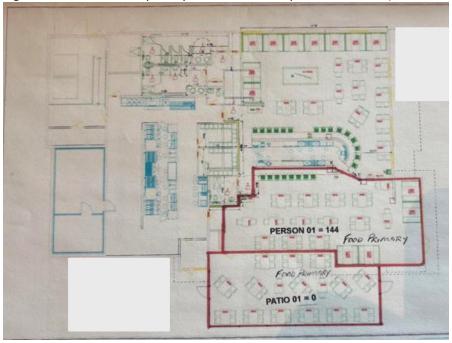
Site Plan – Kelly O'Bryan's Food Primary licenced areas (outlined in red)
